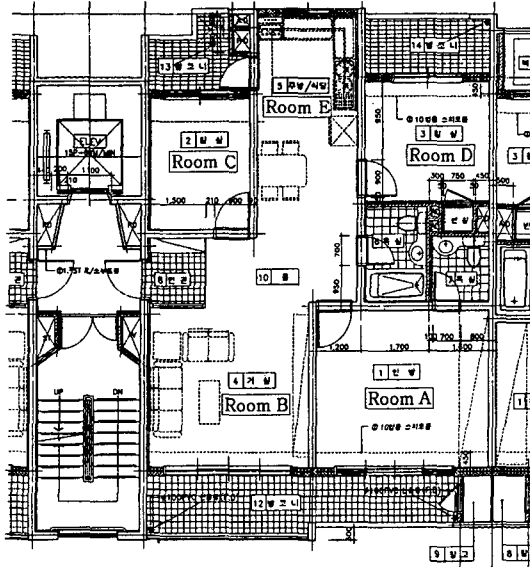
The unit plan of apartment house for simulation.(unit: mm)
